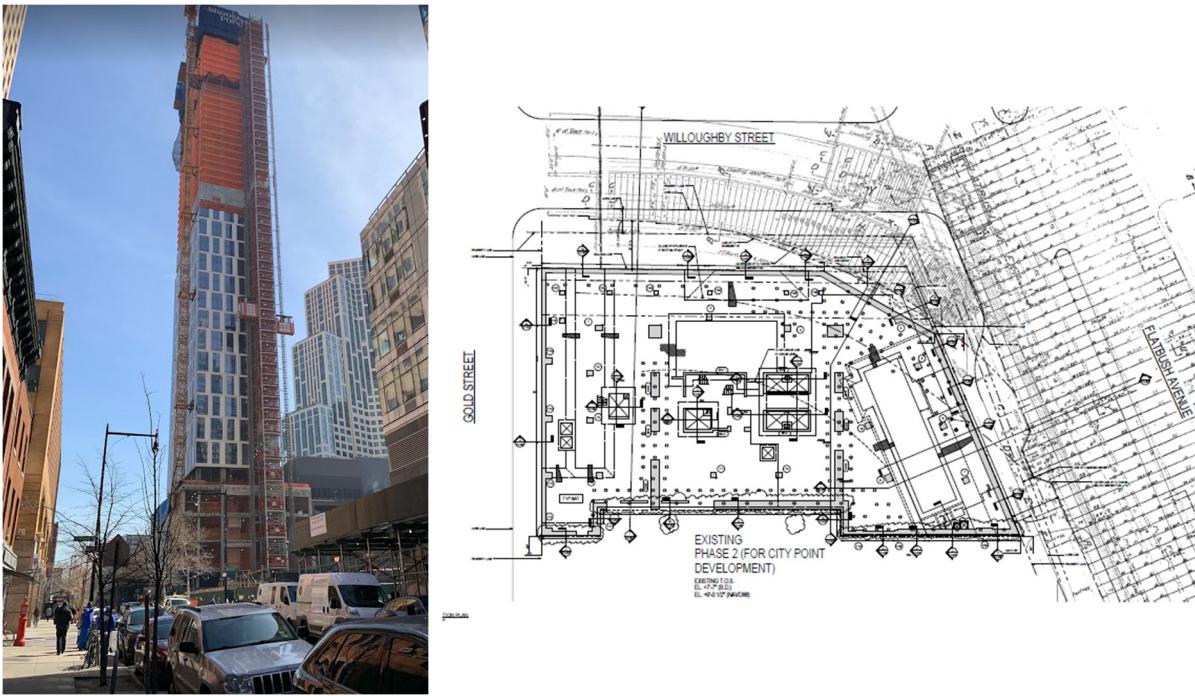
A photo of Brooklyn Point tower under construction and a plan view of the main podium (with KPF / SLCE architects, McNamara Savia structural engineer, Y. Mirzaei structural engineer and Project Manager).
